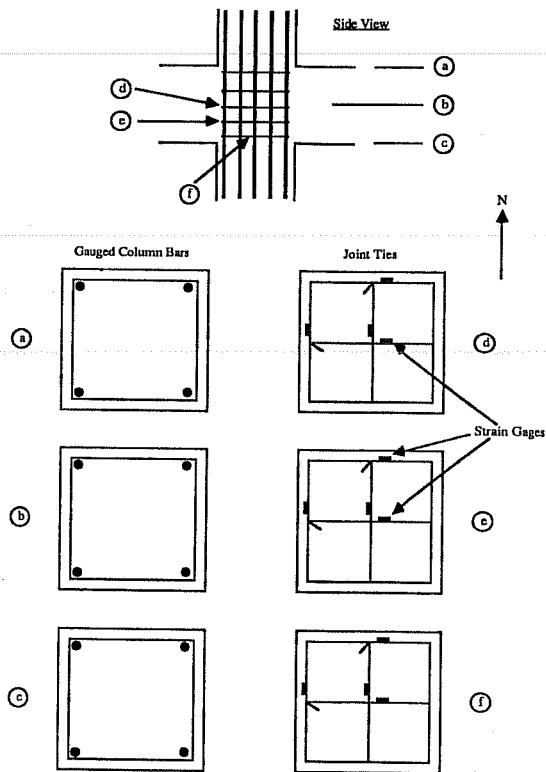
Strain gage positions on column bars and joint ties (Specimen J2)
